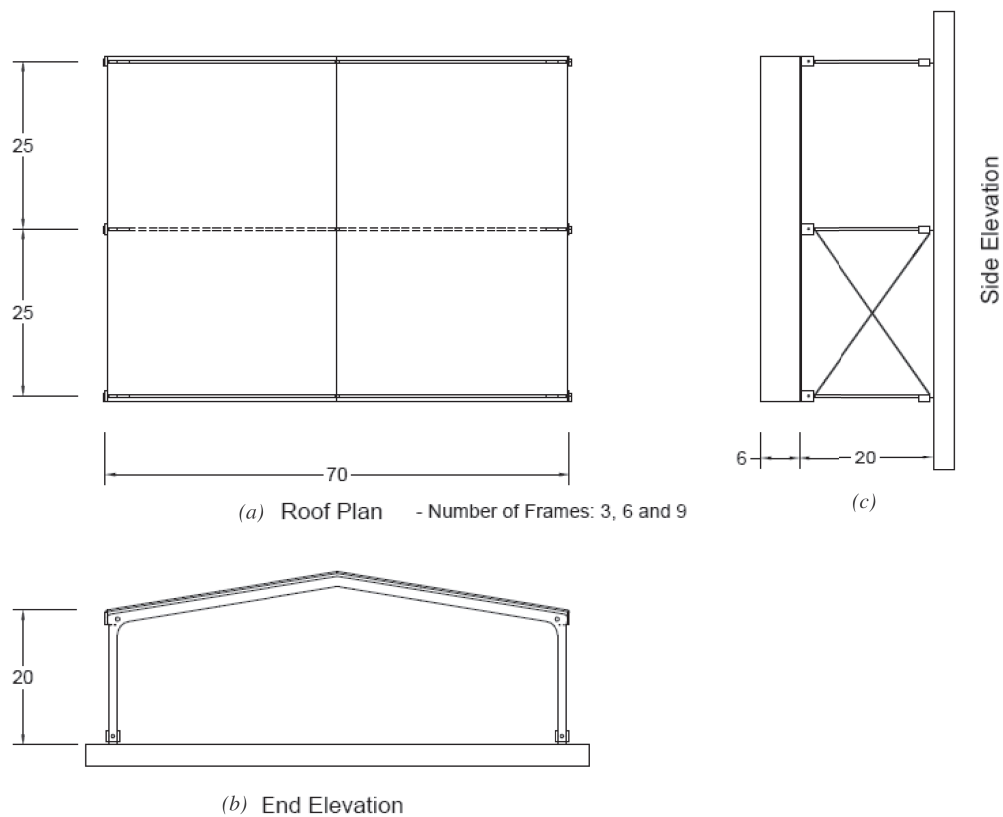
Typical model drawing: (a) roof plan (three, six and nine frames); (b) end elevation showing transverse moment frame; (c) side elevation showing braced frame being evaluated.
